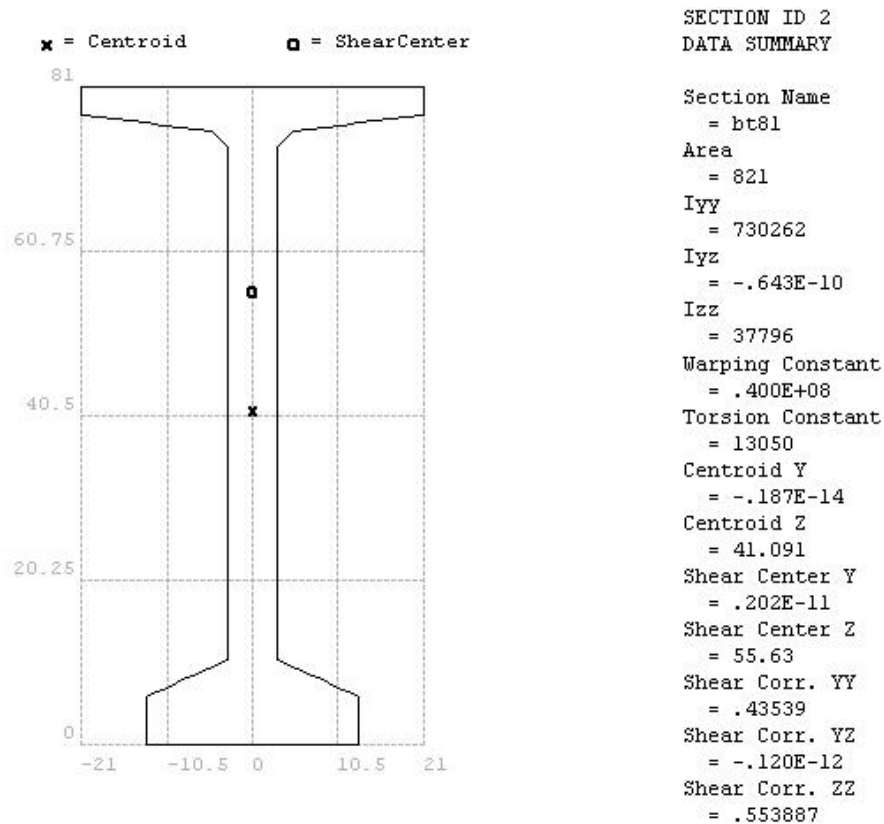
Cross Section of BT81 Girder (units are inches).
